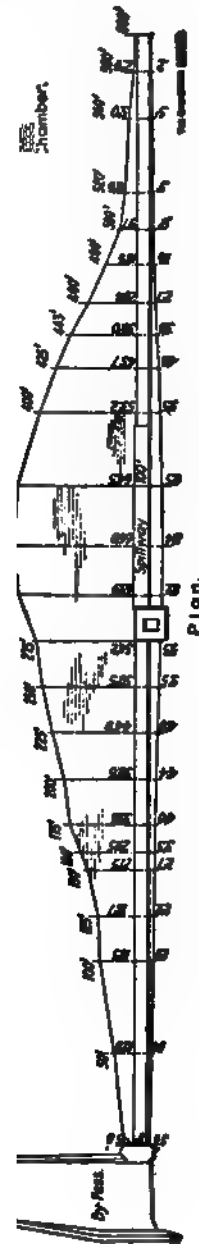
THE CASTLEWOOD DAM. (By permission of "The Engineering Record.")
